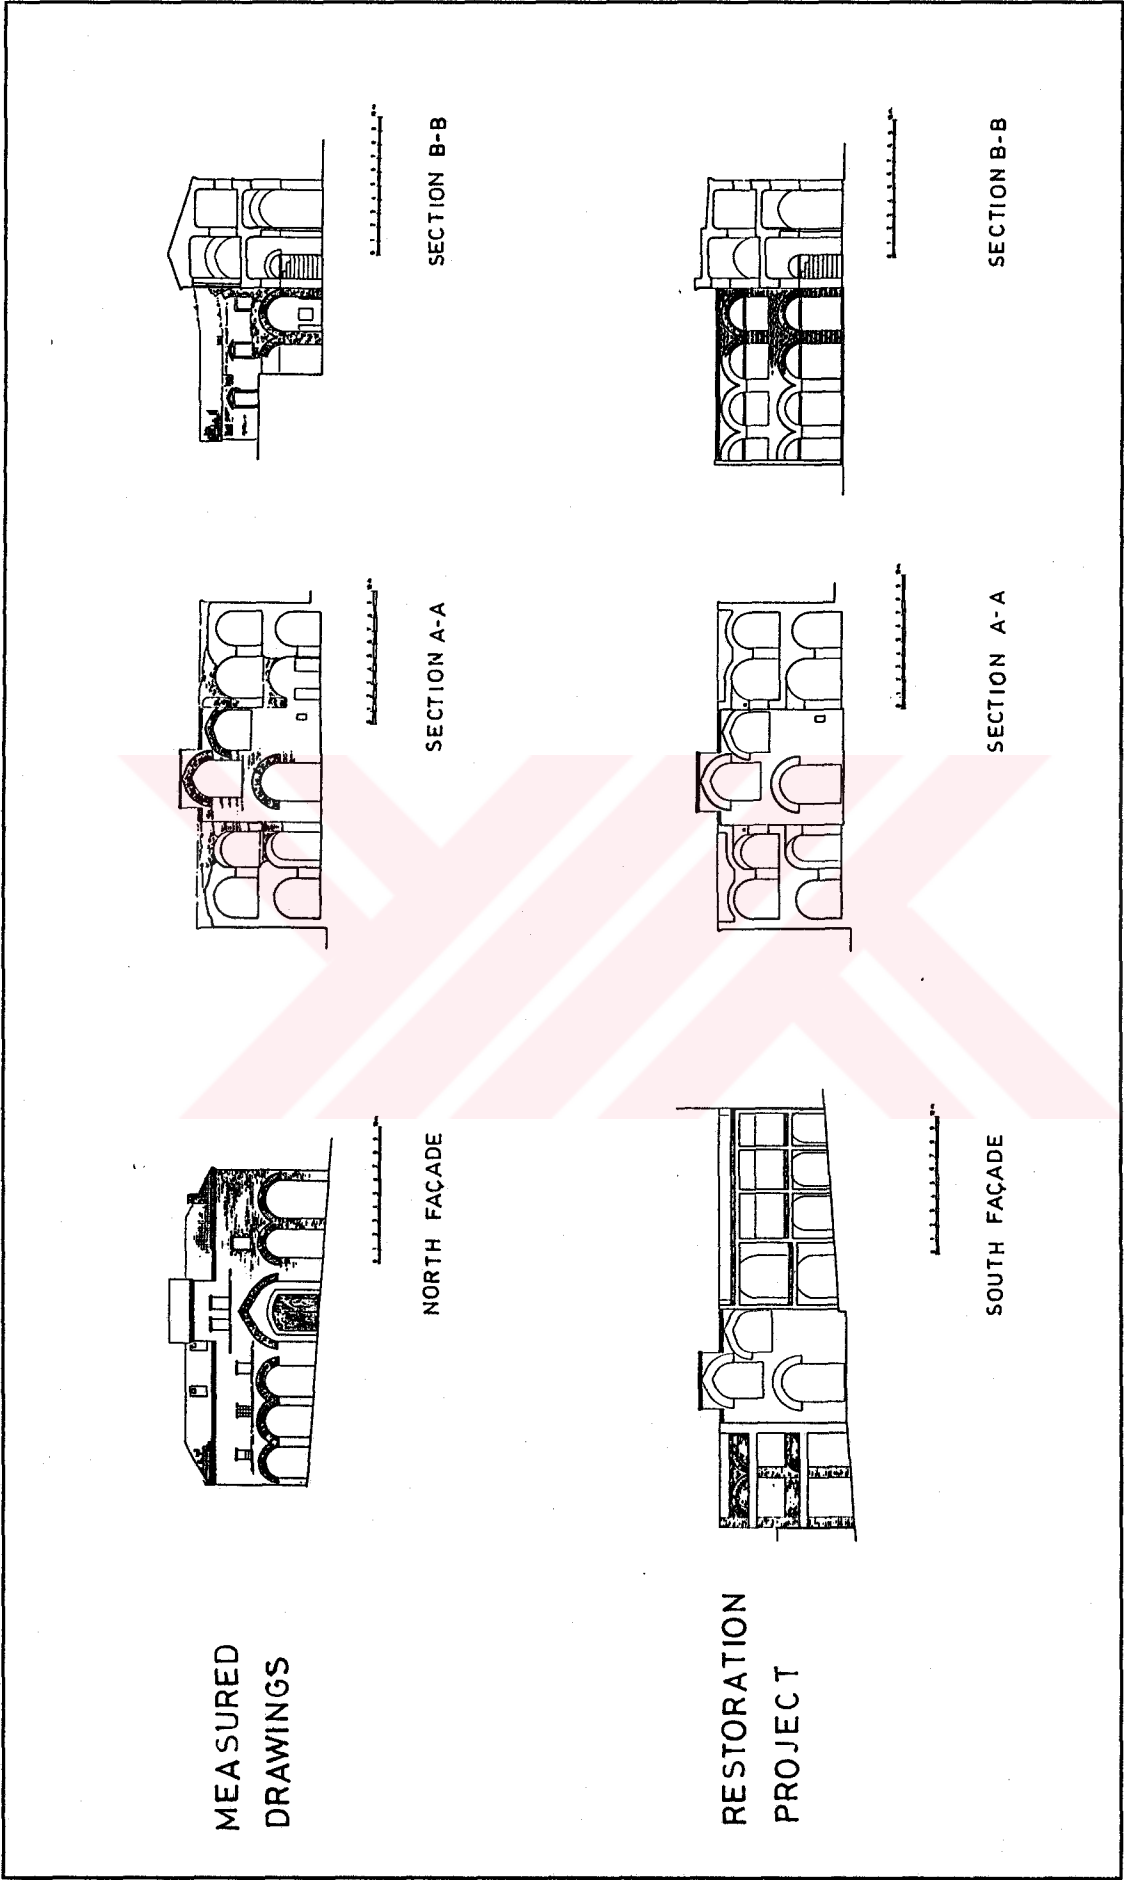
Tire Bakırhan in İzmir - Façade and Section Drawings
